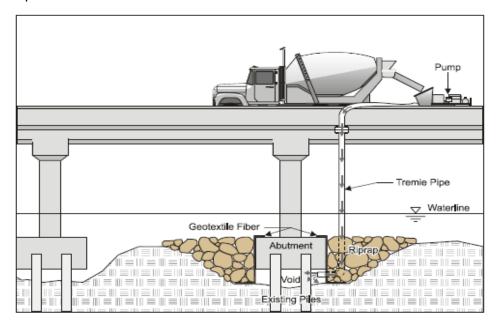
Tremie Concrete Placement used to Repair an Undermined Pile Cap (Courtesy Virginia DOT)
